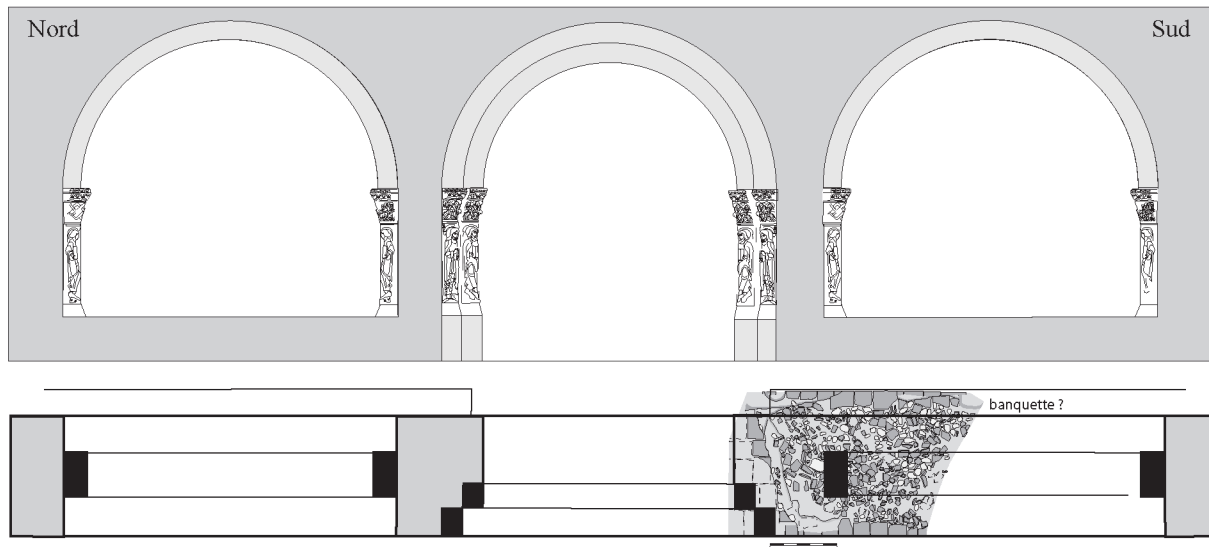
Suggested reconstruction of the chapter house façade (drawing author) (Plate 13)
